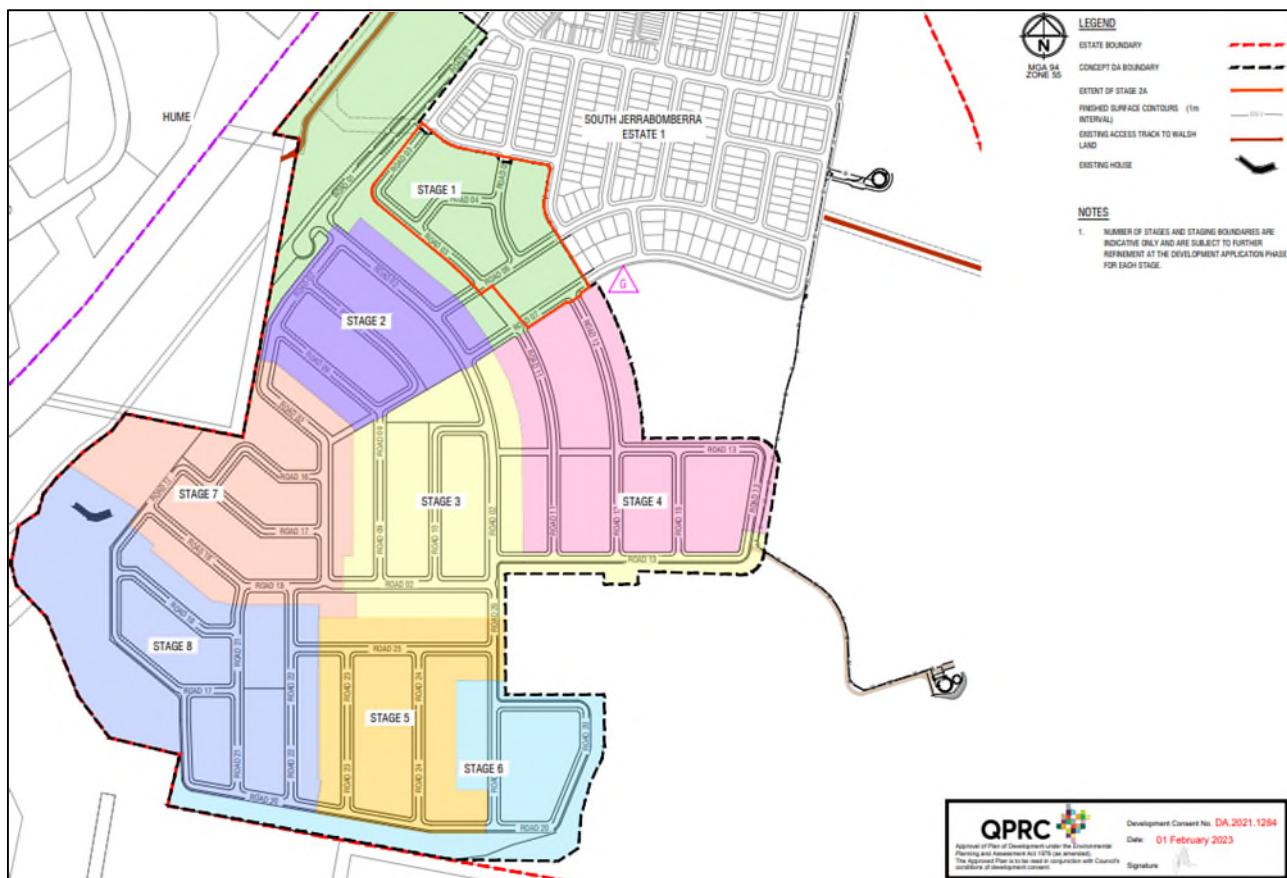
Concept Development Plan – Approved under DA.2021.1284
